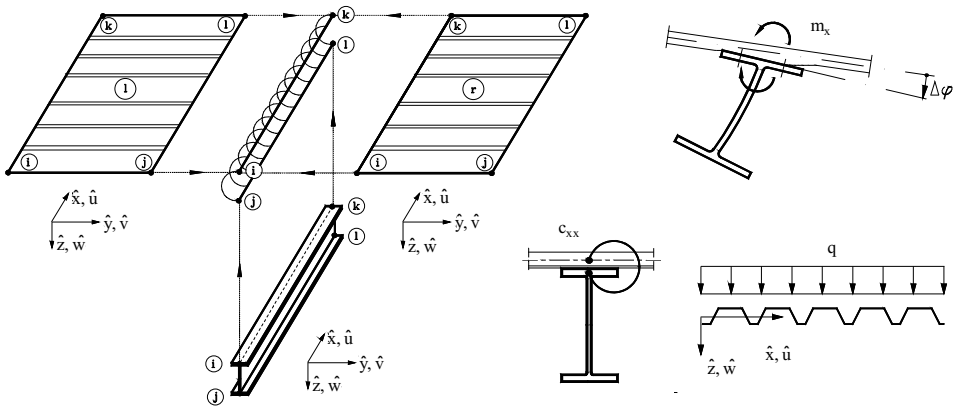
Assembly of the finite elements for trapezoidal sheeting, connection springs and I-beams
